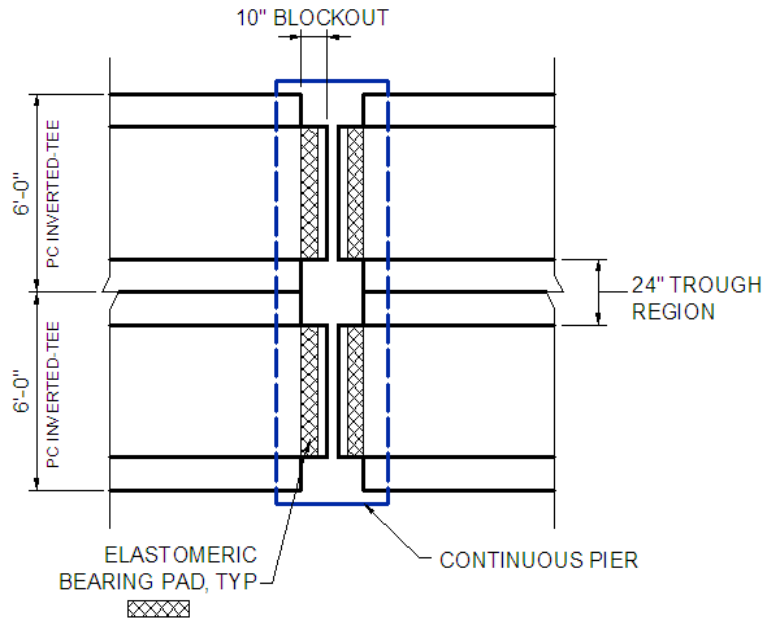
Plan view of a PCSSS flange blockout at a continuous pier to facilitate the development of negative moment at the pier
